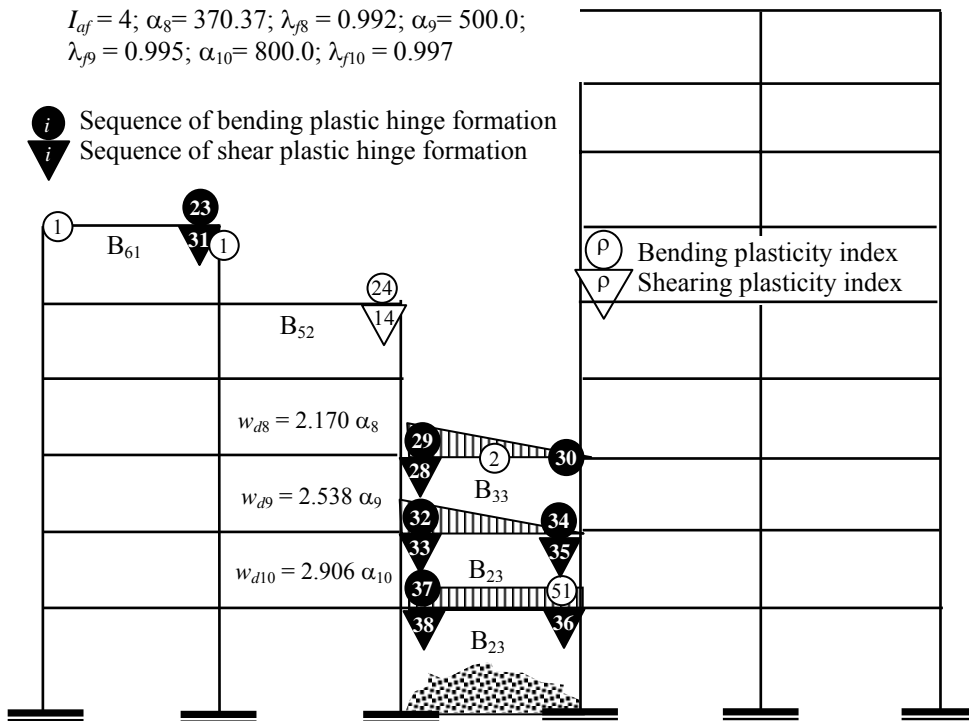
Example 2 (Los Angeles): Beams B₃₃, B₂₃ and B₁₃ progressively fail and fall to ground level (Stages 8, 9, and 10)
